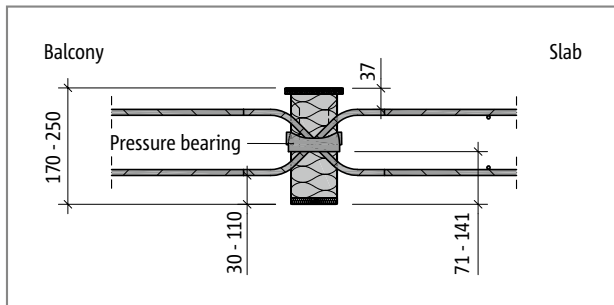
Schöck Isokorb® T type Q-E-VV5: Product section
